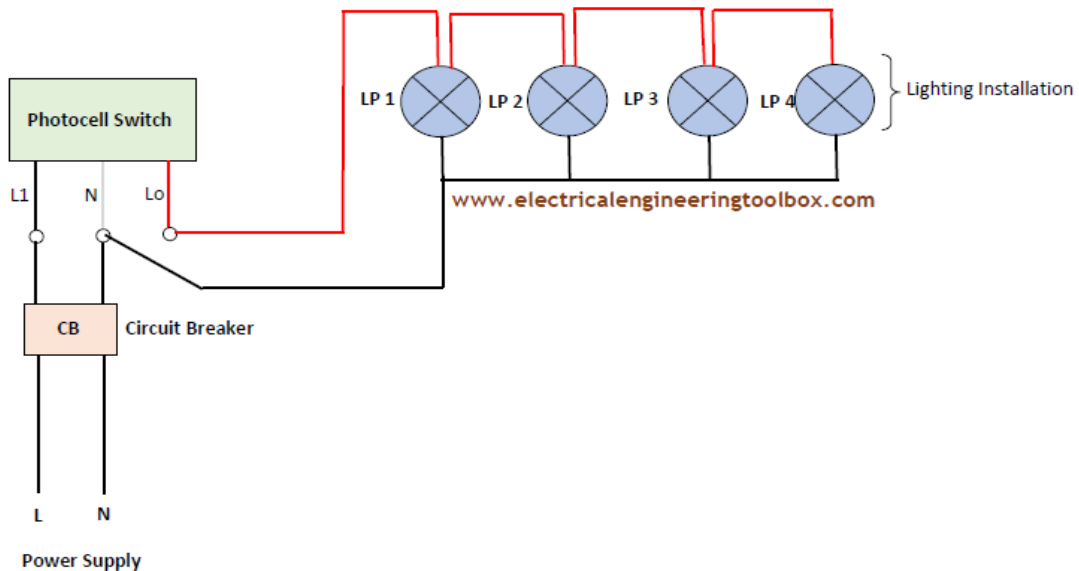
Wiring and installation circuit of photocell switch (Source: How to Install and Wire a Photocell Switch in a Lighting Installation, 2017)
